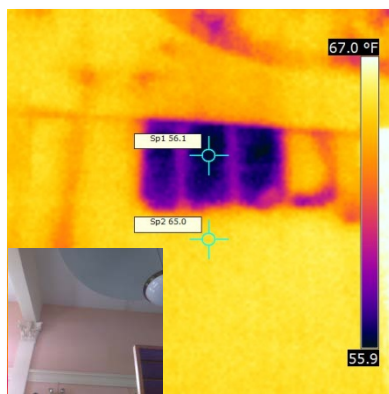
IR Image of 1st Floor Walls with Spot of Missing Insulation
